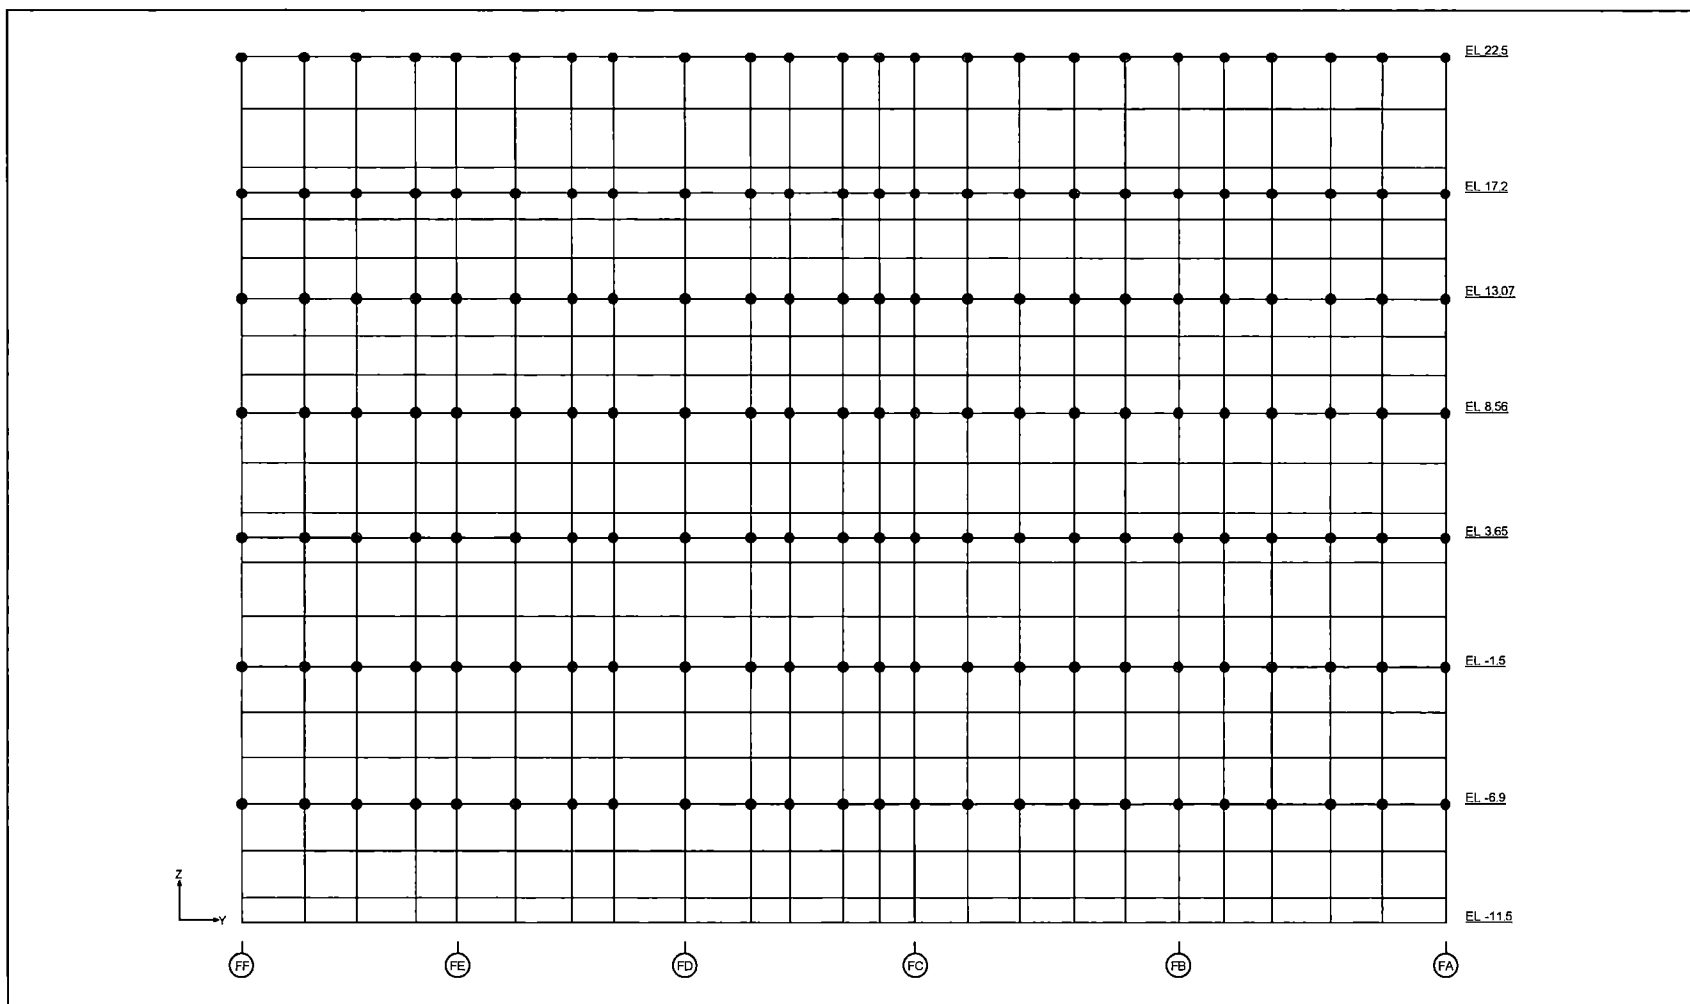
Application of Overturning Moments to the External Wall on F3 Column Line
